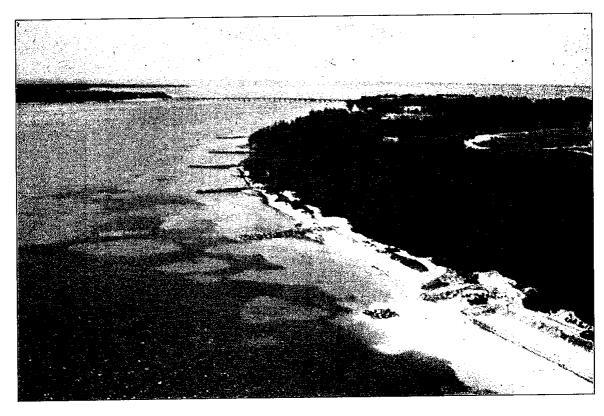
VIRGINIA KEY PHOTO - GROINS UNDER CONSTRUCTION -, (AUG 1973)
